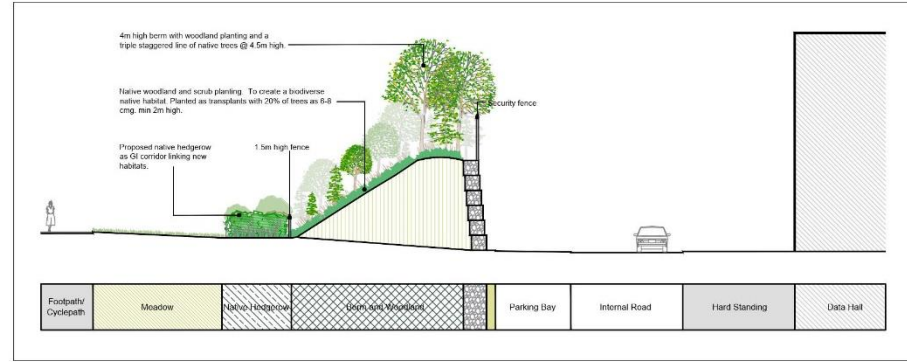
N: Green Infrastructure Plan (Source Kevin Fitzpatrick Landscape Architects)
